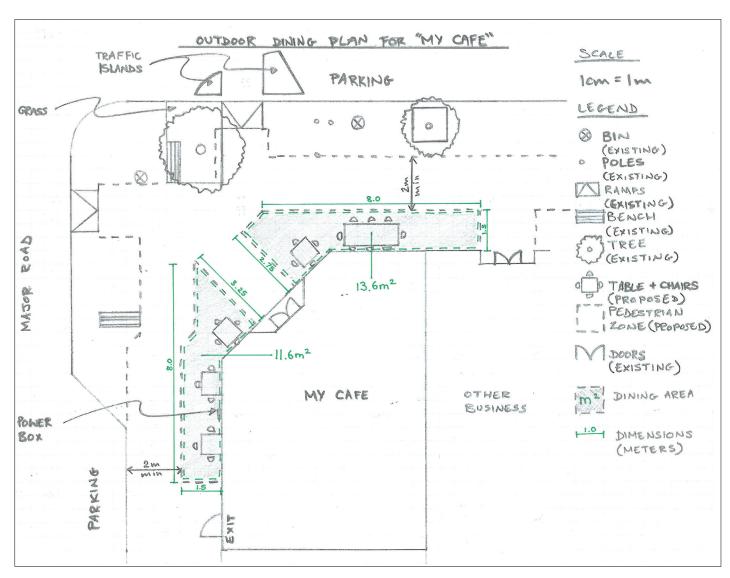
Example of a site plan supporting an application for an on-street dining encroachment licence.
